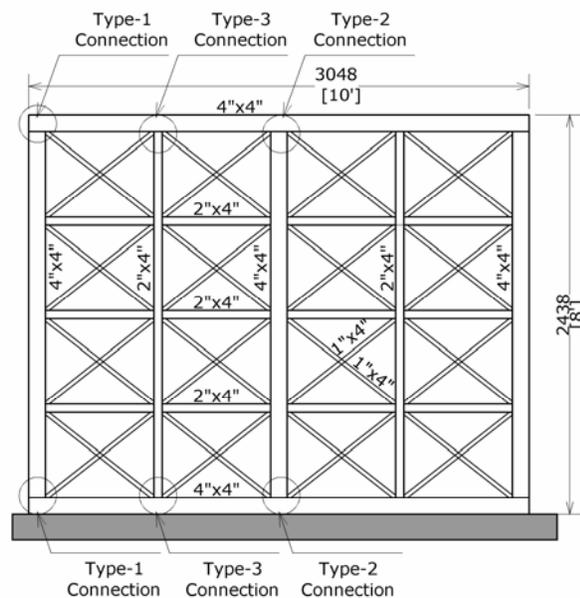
Dhajji wall test specimen, wall and member sizes, and configuration
